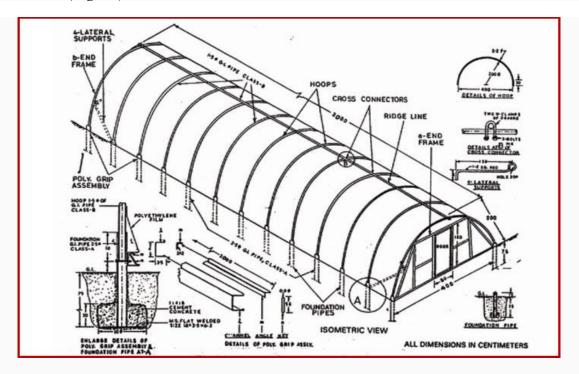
Constructional details of pipe framed greenhouse (Source: www.tnau.ac.in)
